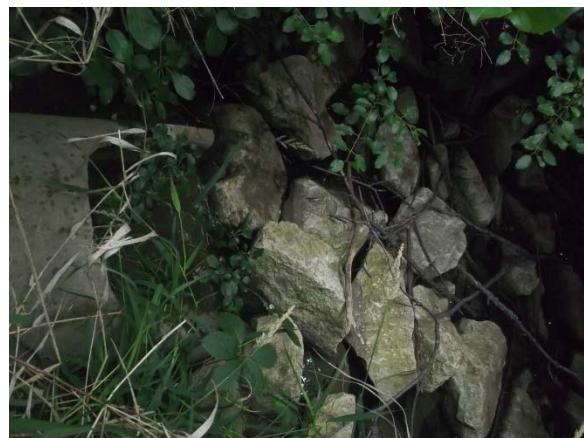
Outfall for the Pond Structure, Located Southeast of the Pond
